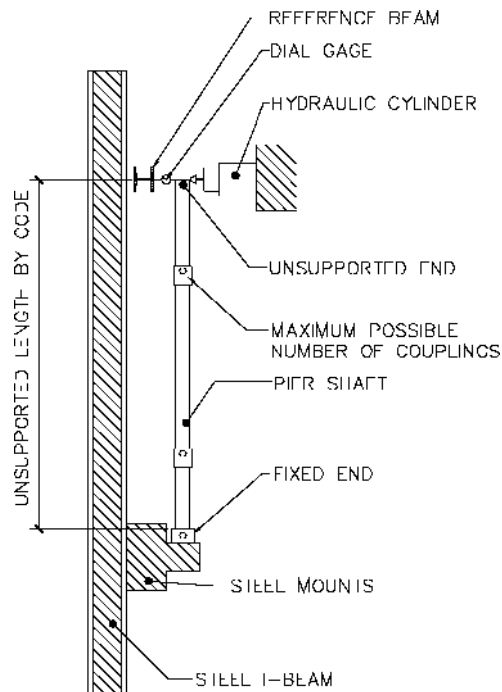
COUPLER RIGIDITY EXAMPLE LABORATORY TEST SETUP
